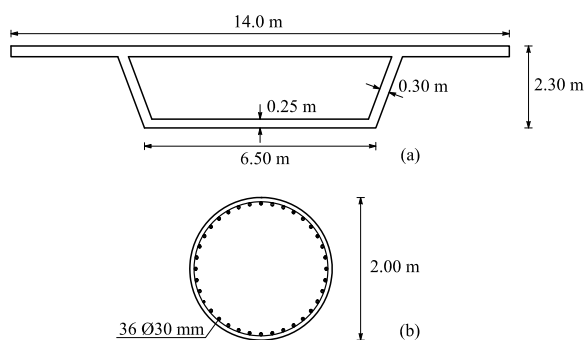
RC bridge: (a) deck cross-section; (b) pier cross-section, with reinforcement layout.
